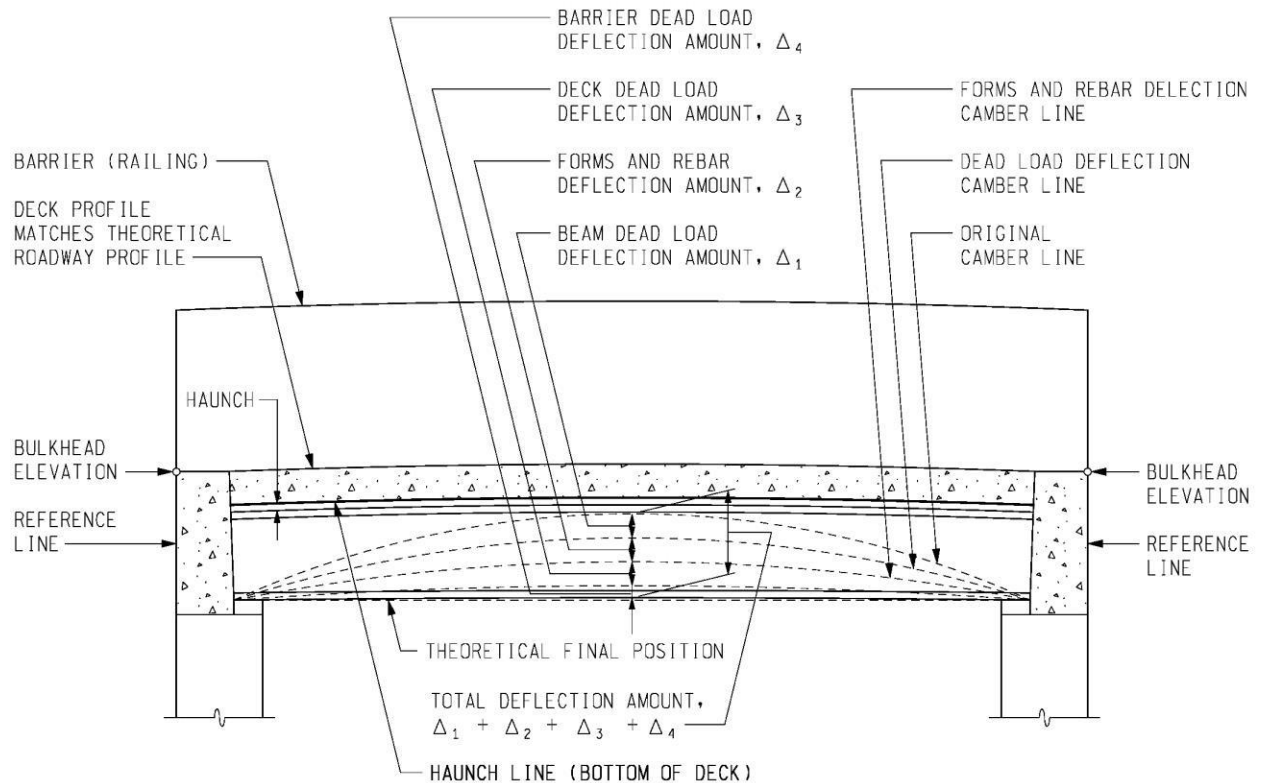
Deflection of the beam due to the weight of sidewalk or barrier
